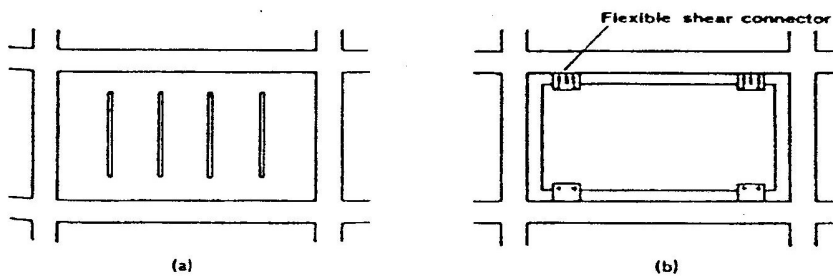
Ductile shear walls (a) slit shear wall (b) shear wall with flexible shear connectors.
